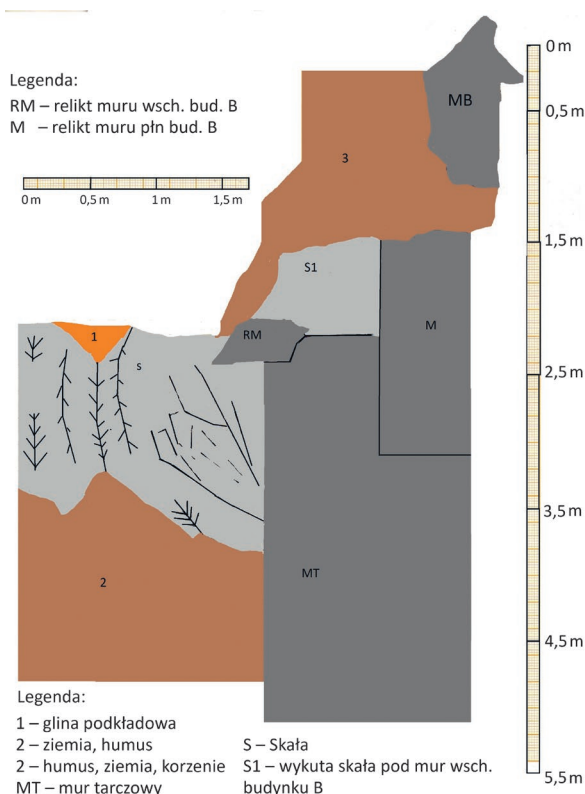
Pieniny Castle, cross-section through the basement (drawing by D. Gazda)
